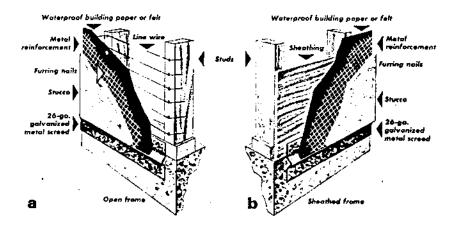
Exterior wood framed construction: (a) unsheathed; (b) sheathed. Line wire is not required with paper-backed reinforcement. (Courtesy of Portland Cement Association.)
